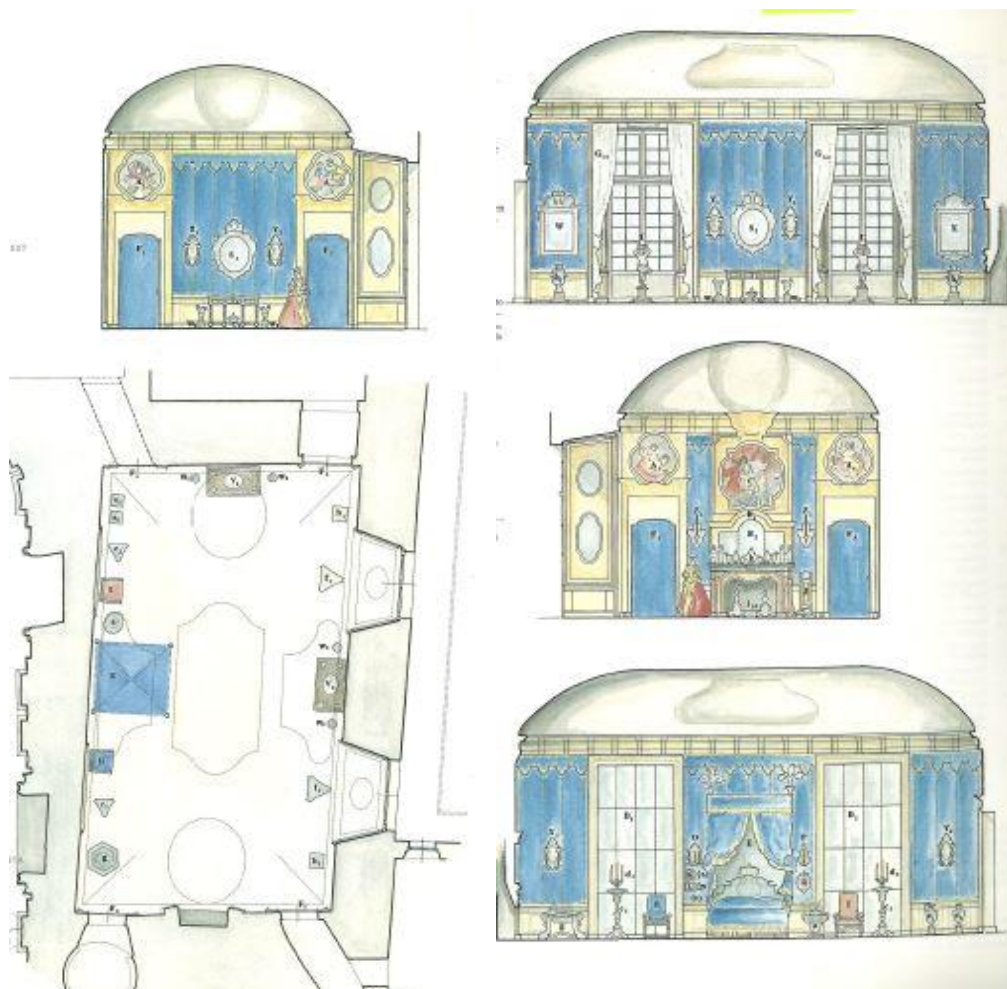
Historical reconstruction (Madama Reale bedroom)
